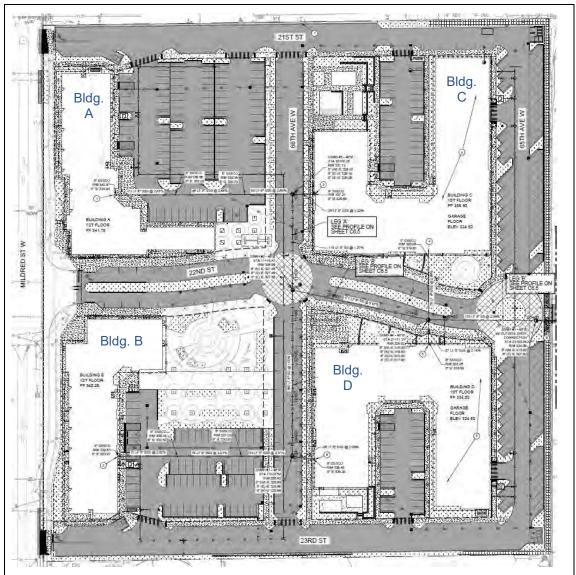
Proposed site plan modified from Sheet C7.0 prepared by DCG, 12/12/2022. (North is to the top of the plan)
